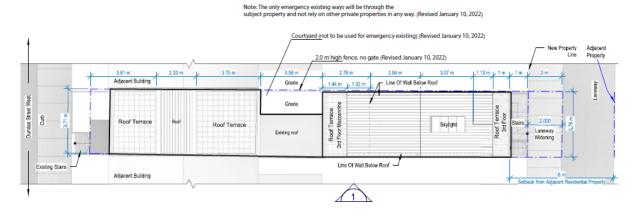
Exhibit 13, Revised Site Plan Jan 10, 2022
